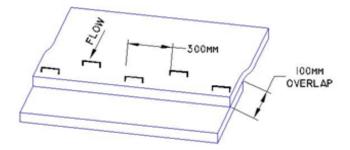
Overlap detail for channels and areas subject to in stream or surface water flow
